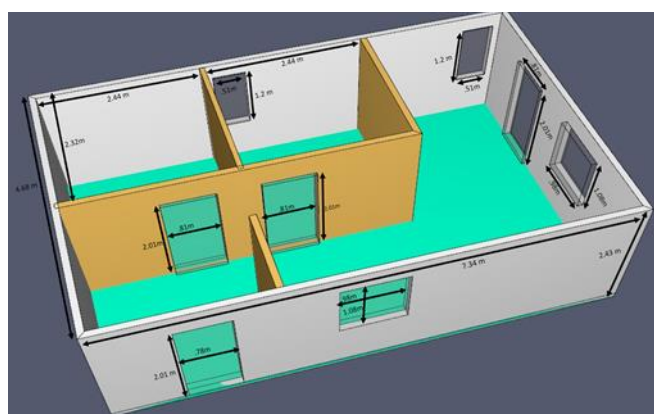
The test room is prepared following a similar layout of the dwellings to be constructed in Karmøy ROP project. The whole apartment has a floor area of 35 m<sup>2</sup>.
